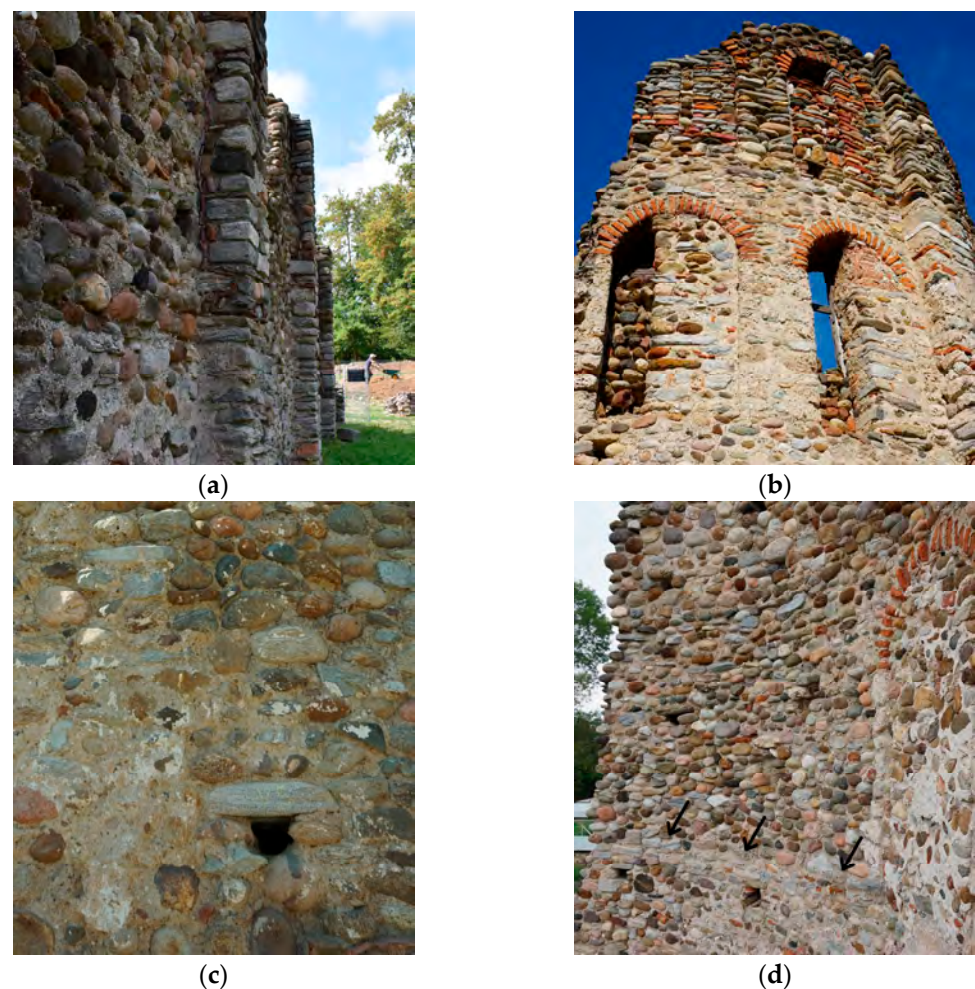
Constructive details of S. Giovanni: (a) half pilasters along the north wall with tile fragments bordering the integrated parts; (b) blocked windows and buttresses added onto the apse (from the outside); (c) scaffolding holes in the apse; (d) horizontal joint connected to a construction stage in the apse (black arrows).
